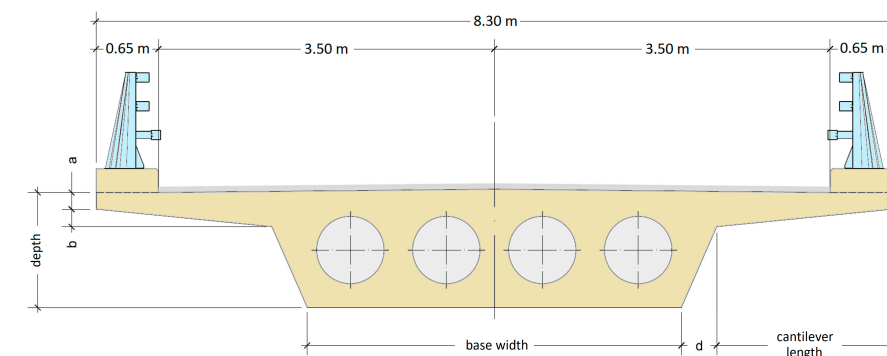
Cross-section of the lightweight PC slab bridge deck.
